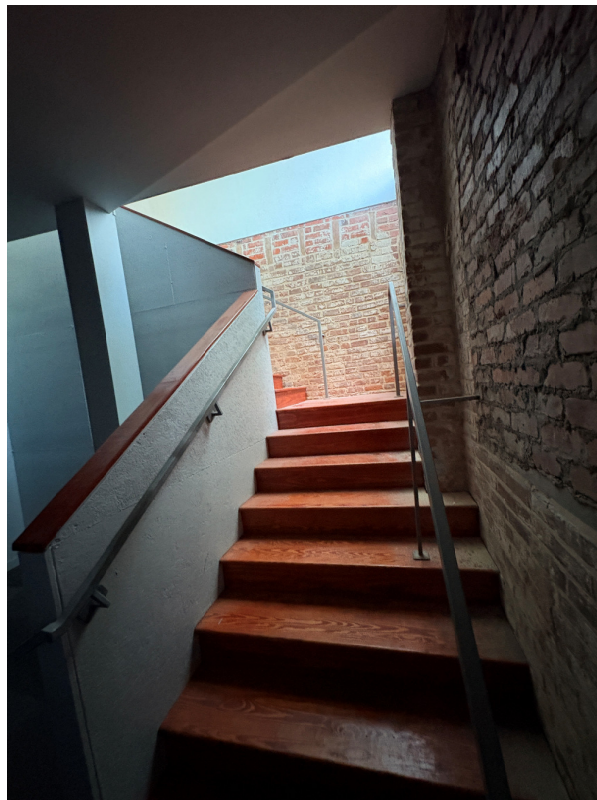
Interior Basement 5 side looking at exit stair to Broad St
